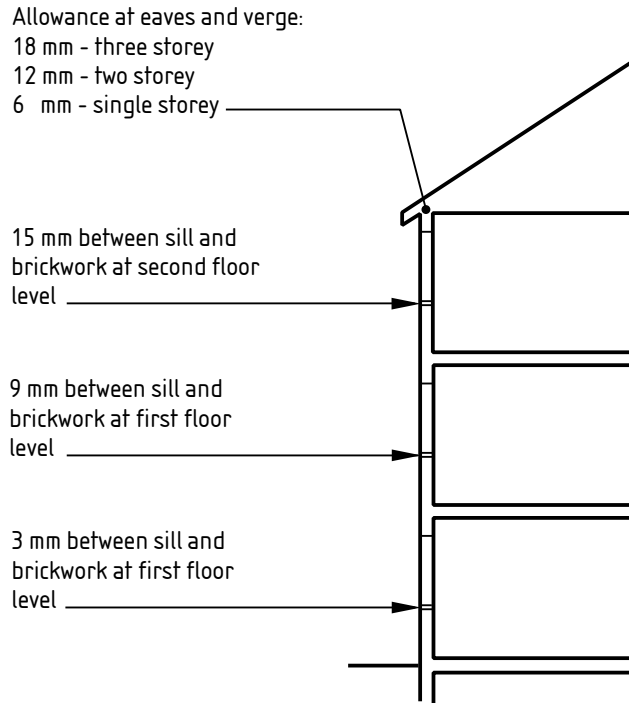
Recommended allowances for differential movement between the timber frame structure and brick cladding
